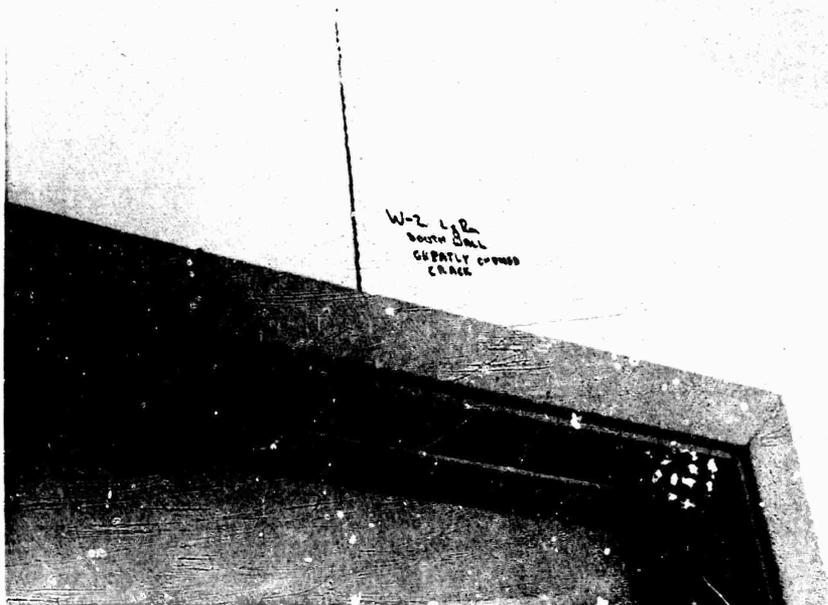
w-3, Old Crack Marked 5-20-65 Has Greatly Enlarged
